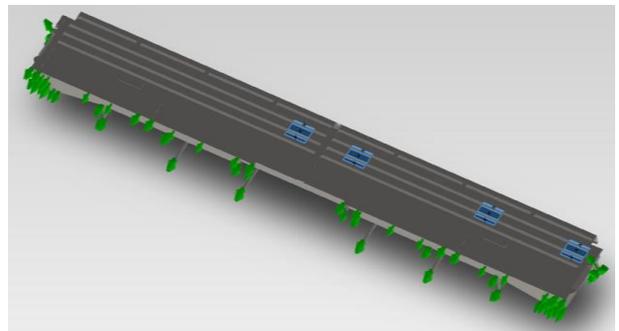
Boundary conditions for vertical and horizontal loading for position of truck on the boundary of the bridge.
